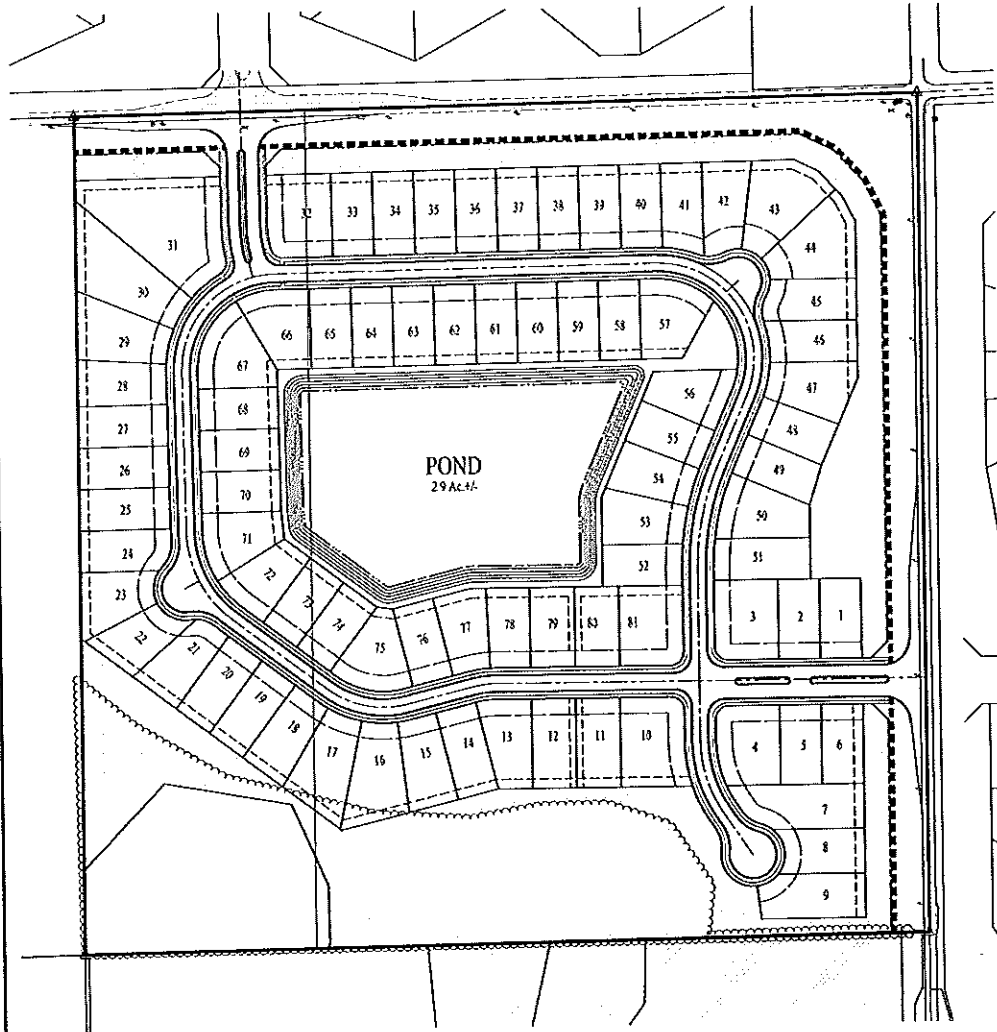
CONCEPT PLAN - THE ENCLAVE
